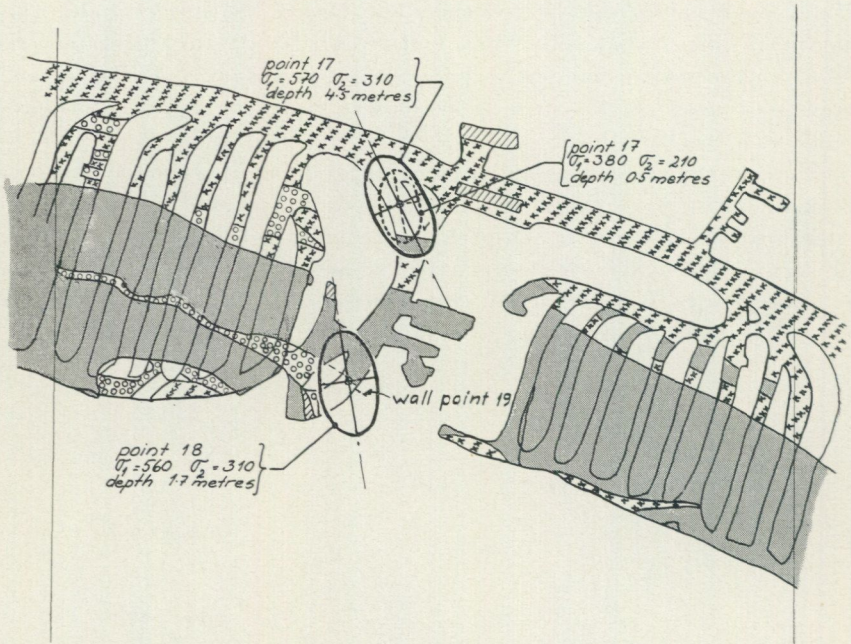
410 metre level with roof points 17, 18 and wall point 19.
